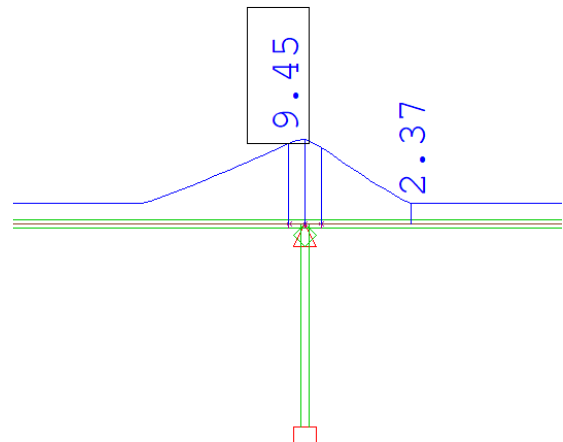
Area of top longitudinal reinforcement [mm<sup>2</sup>] after Design ULS (Design Elements). Support conditions affects on the moment reducing and no extra reinforcement appears.
